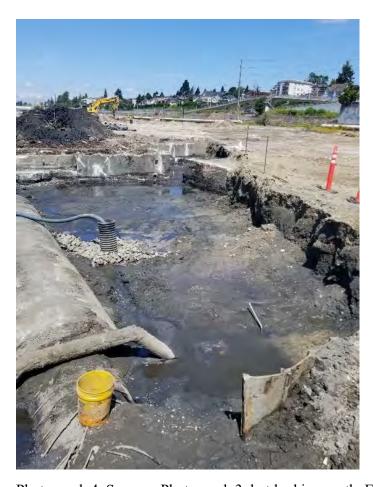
South end of excavation, looking east. North-south-trending wooden utilidor on west side of concrete foundation elements.
